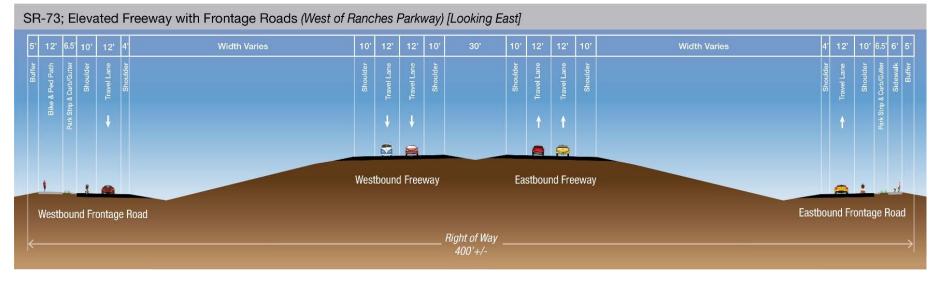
Typical Elevated Section West of Ranches Parkway
